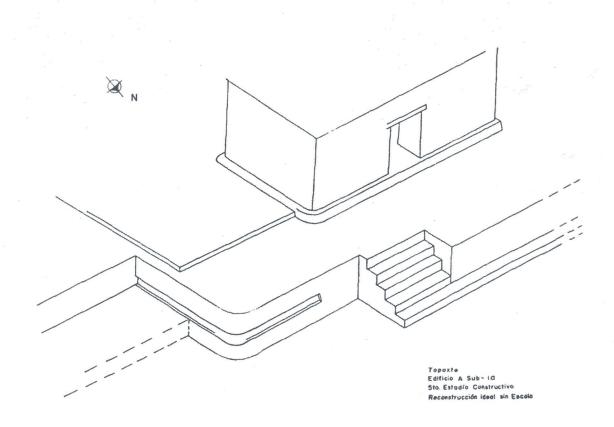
Ideal reconstruction of Building A Sub 1a, Topoxte.
